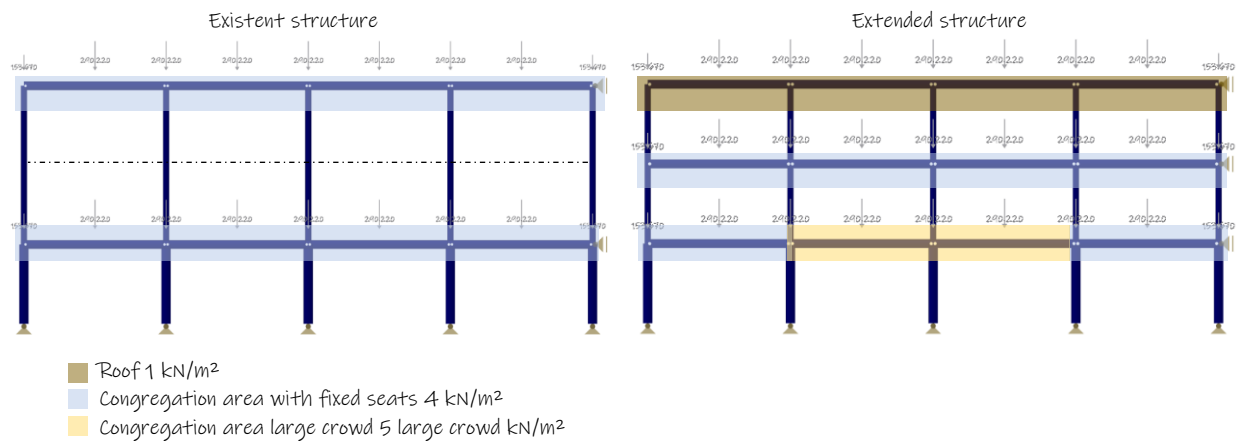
The existing convertible scalable design structure and original loads (left) contrasted with the extended structure and updated loads (right). A detailed legend for clarity (bottom).
